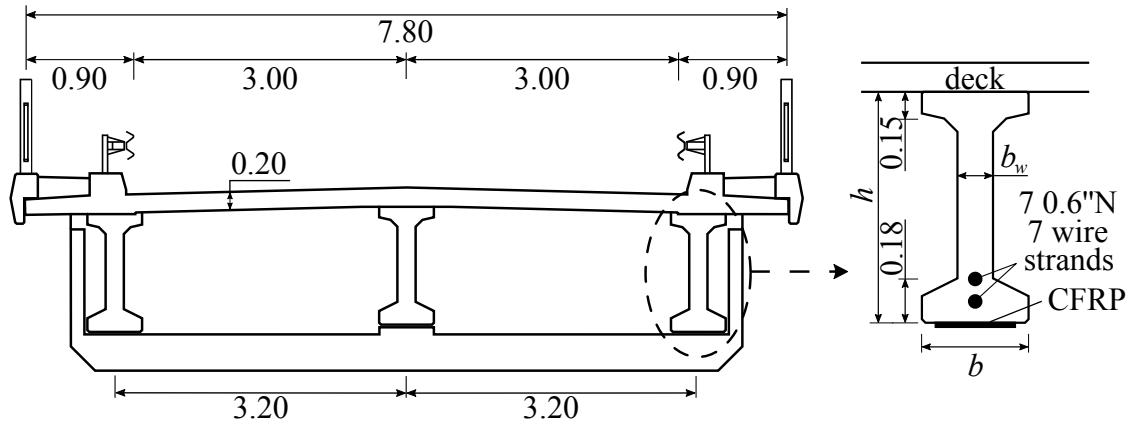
Bridge cross-section and details of the exterior girder (m).
